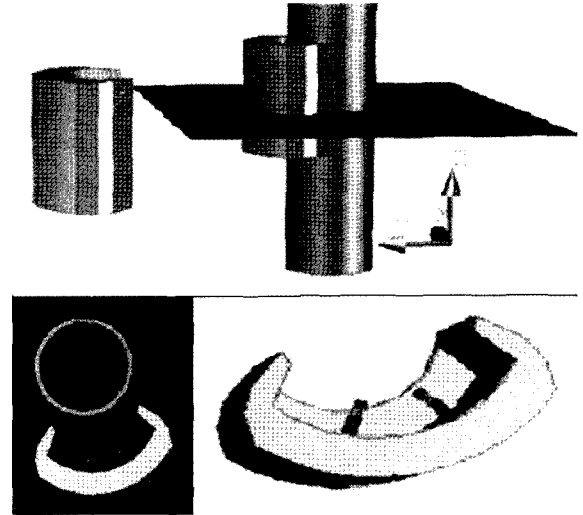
Image of a Dry Processing Sector Caisson to the large steel pile structure
